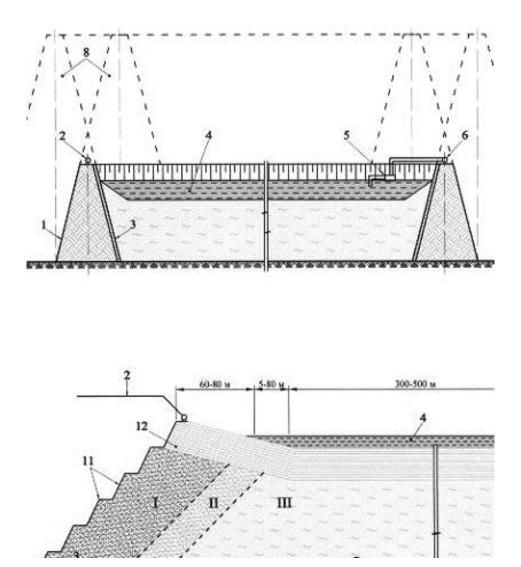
Tailings dam scheme: I – retaining prism; II – transition zone; III – central zone. 1 – protecting dam; 2 – slurry pipeline; 3 –screen of polymeric materials or clayey soil; 4 – pool; 5 – floating pump station for recycling water supply; 6 – conduit of recycle water; 7 – deposits of tail material; 8 – options of protecting dam buildup; 9 – starter dam of career soil; 10 – drainage; 11 – alluvium circle; 12 – alluvium layer. [M means m]
